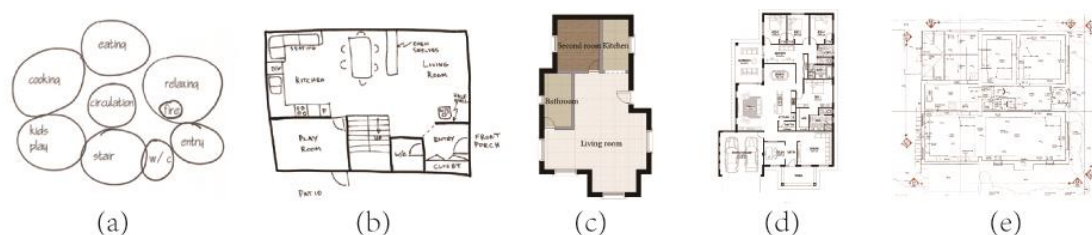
Floorplans contain different levels of information in different architectural design stages. (a) Bubble diagram. (b) Sketches. (c) Room layout diagram. (d) Fine drawing floorplan. (e) As-built floorplan.
